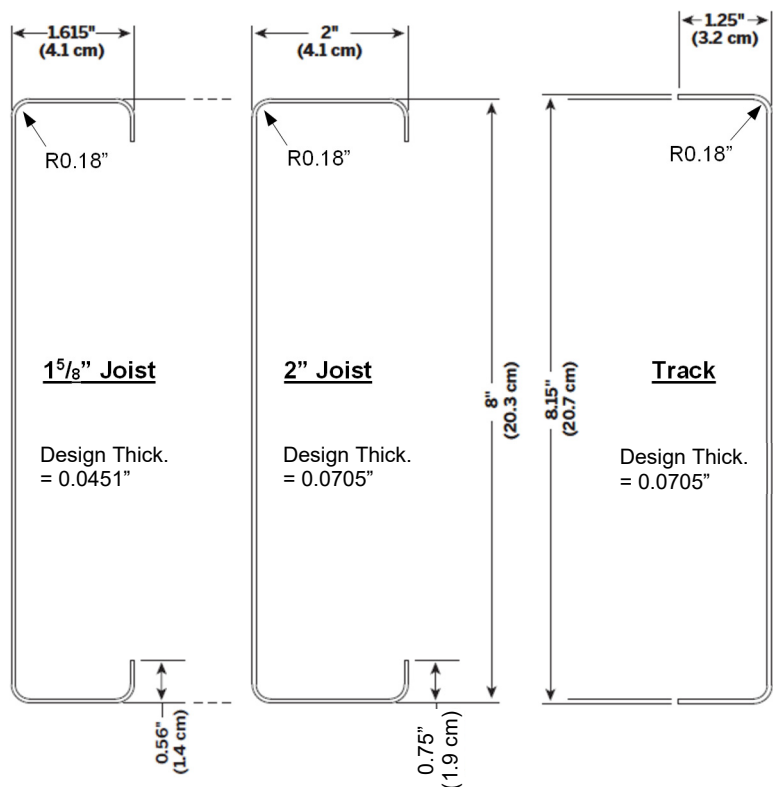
NEW CASTLE FRAMING JOISTS AND TRACKS
